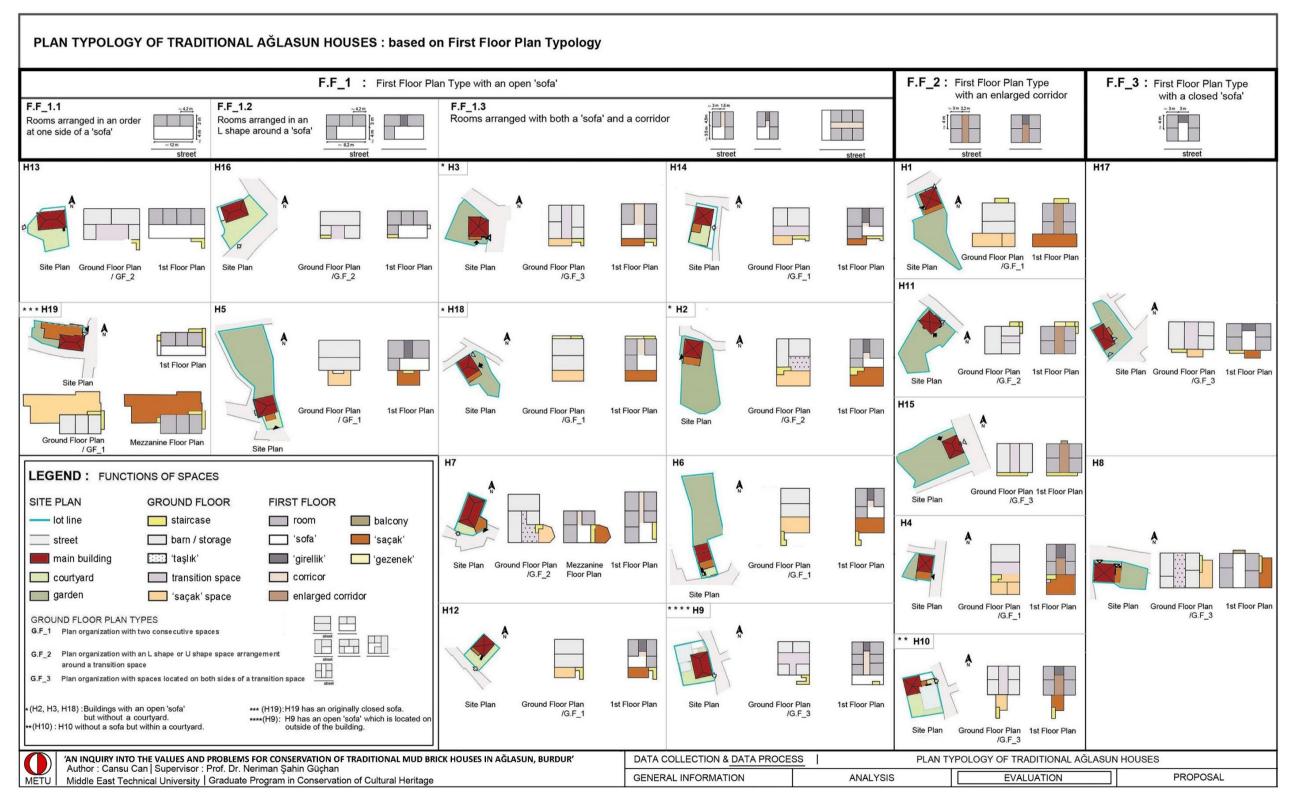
The image shows the First Floor Plan Type 2 and the First Floor Plan Type 3.
